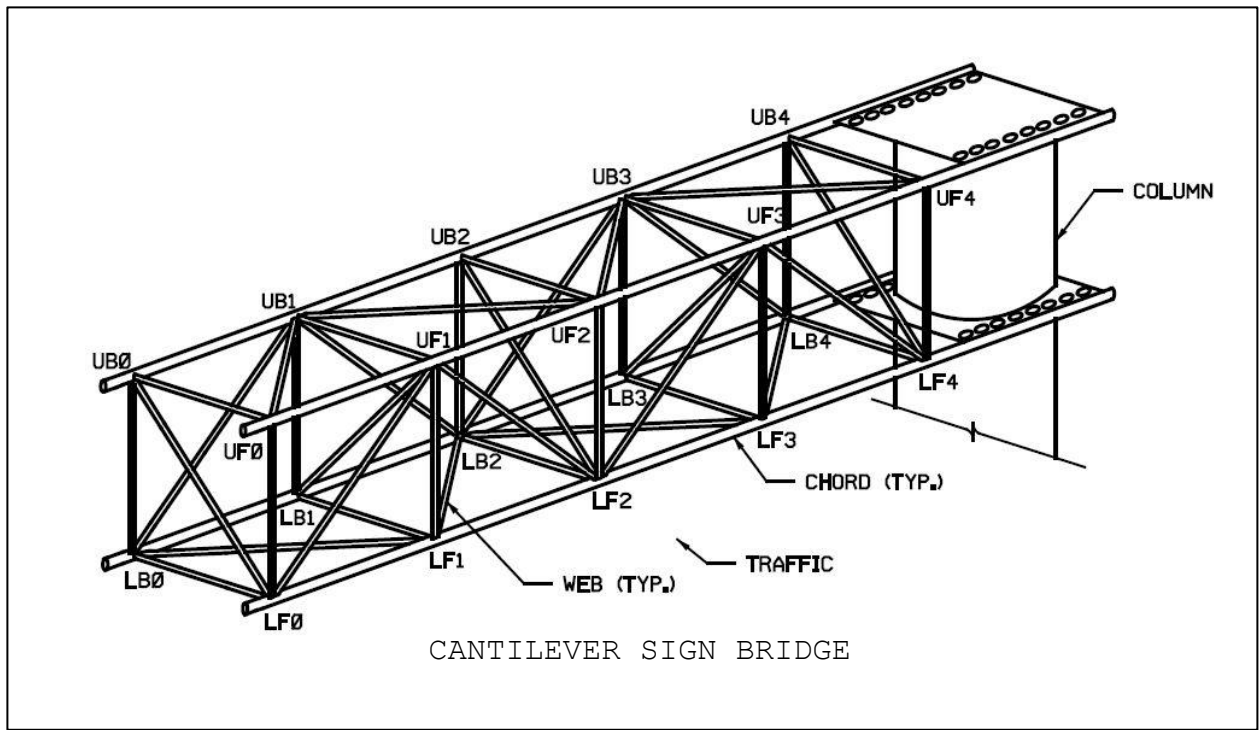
Typical Inspection Numbering System for Cantilever Sign Bridge.
